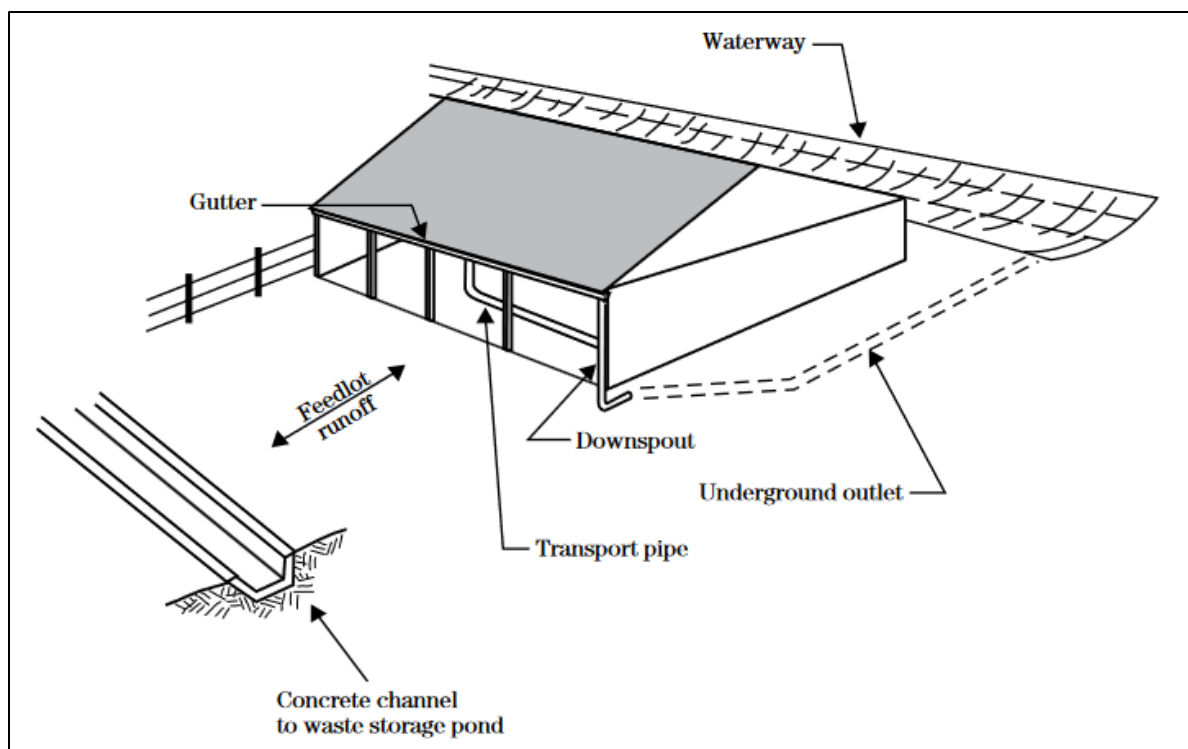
Diagram of roof gutter and downspout system. Water should exit through downspouts into underground outlets to be transported to other diversion BMPs. Any water that runs off feedlot surfaces should be transported to waste storage (NRCS 2009).
